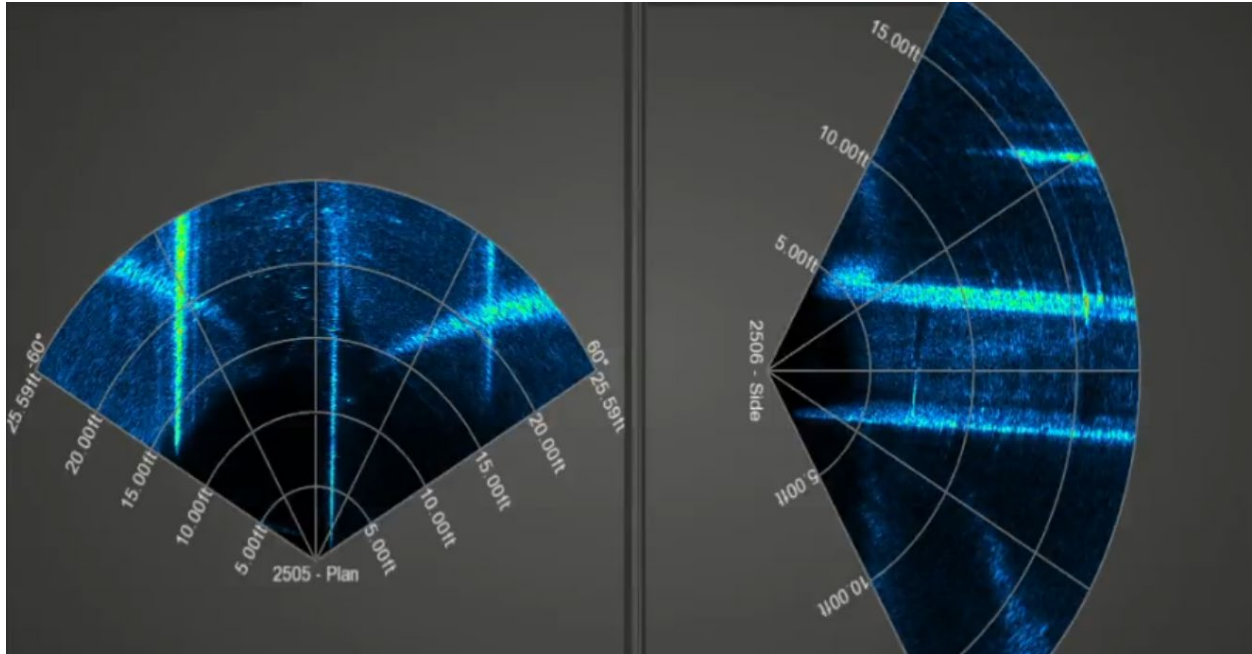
Plan View Sonar (left side) and Right Wall Sonar (Right side) showing wall joint with offset
